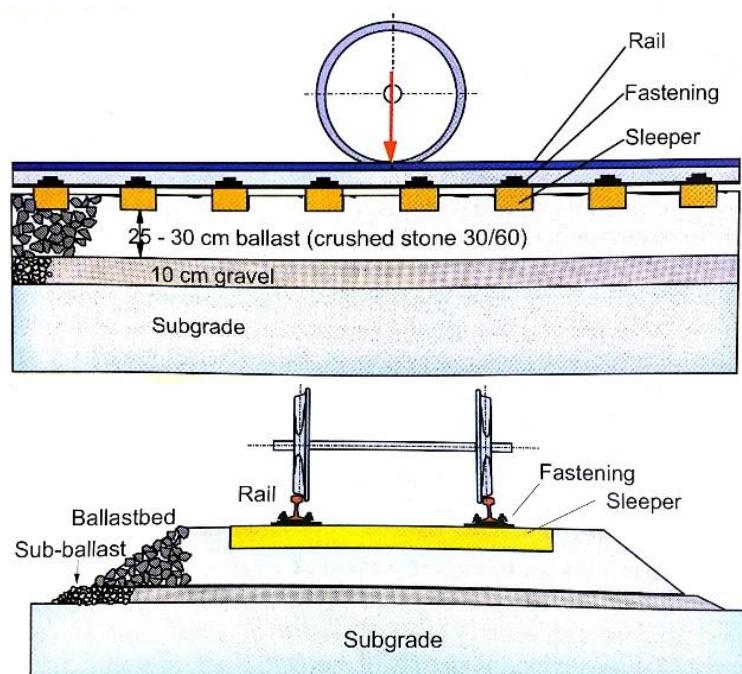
Ballasted track structure on a subgrade. Top: longitudinal section view. Bottom: cross section view, (Esveld, 2001).
